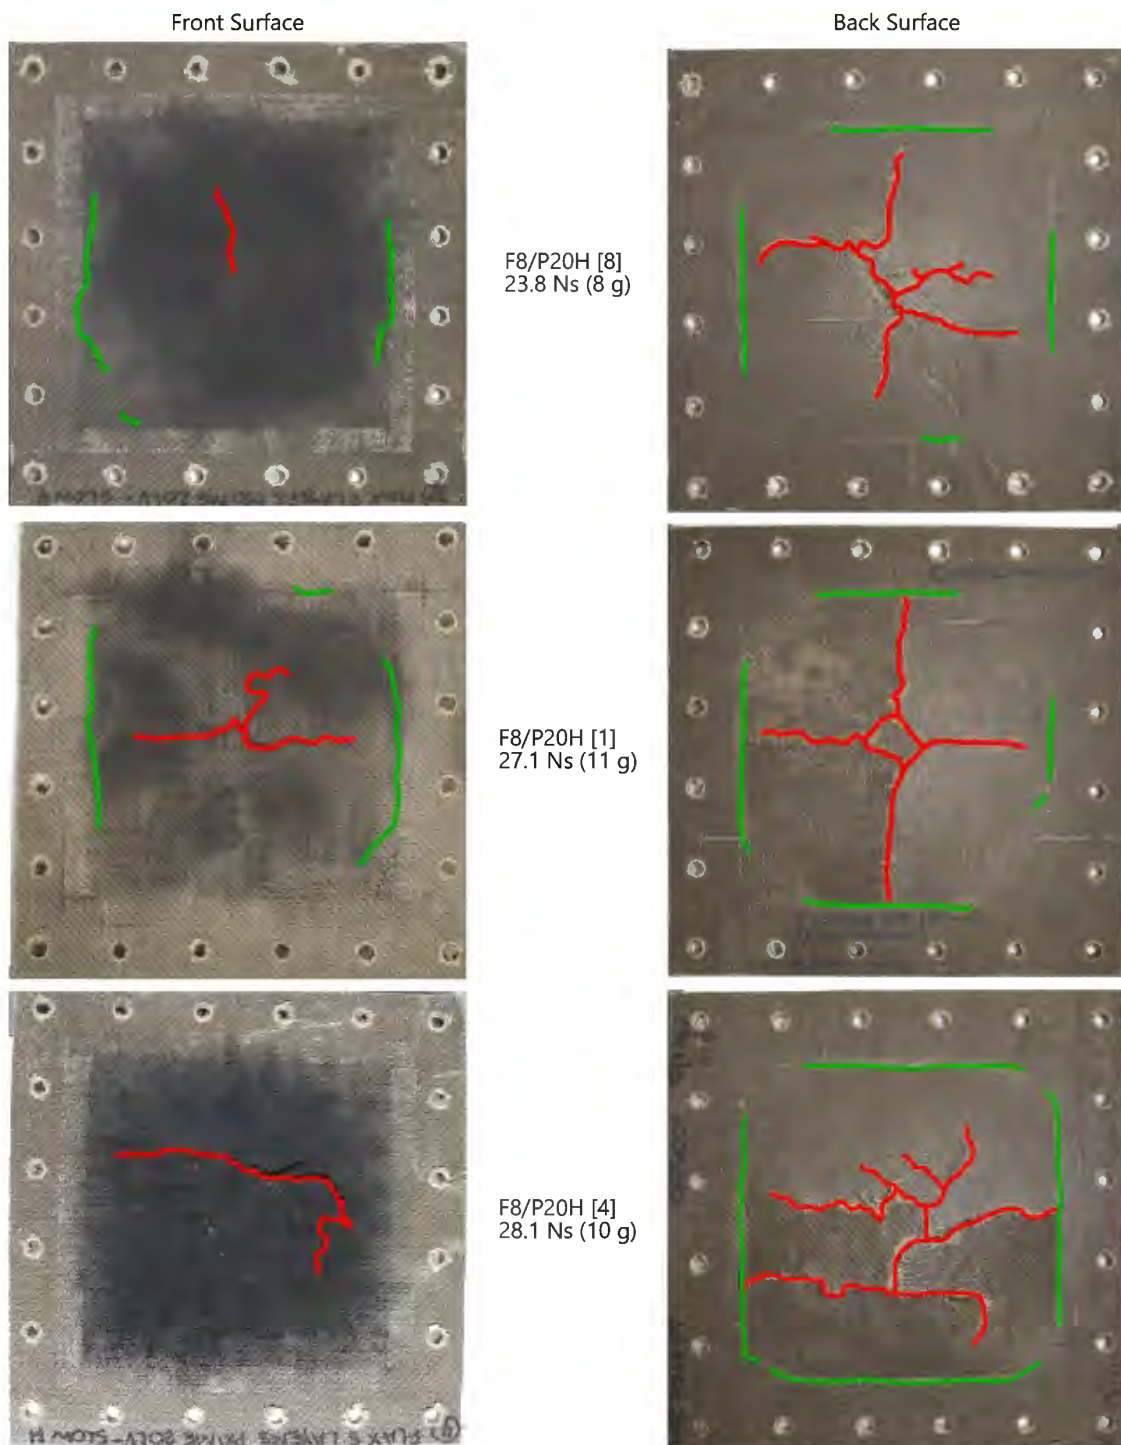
Outstanding photographs of the front and back surfaces, with crack tracings, of different blast tested hand lay-up Flax 8/Prime 20LVpanels
